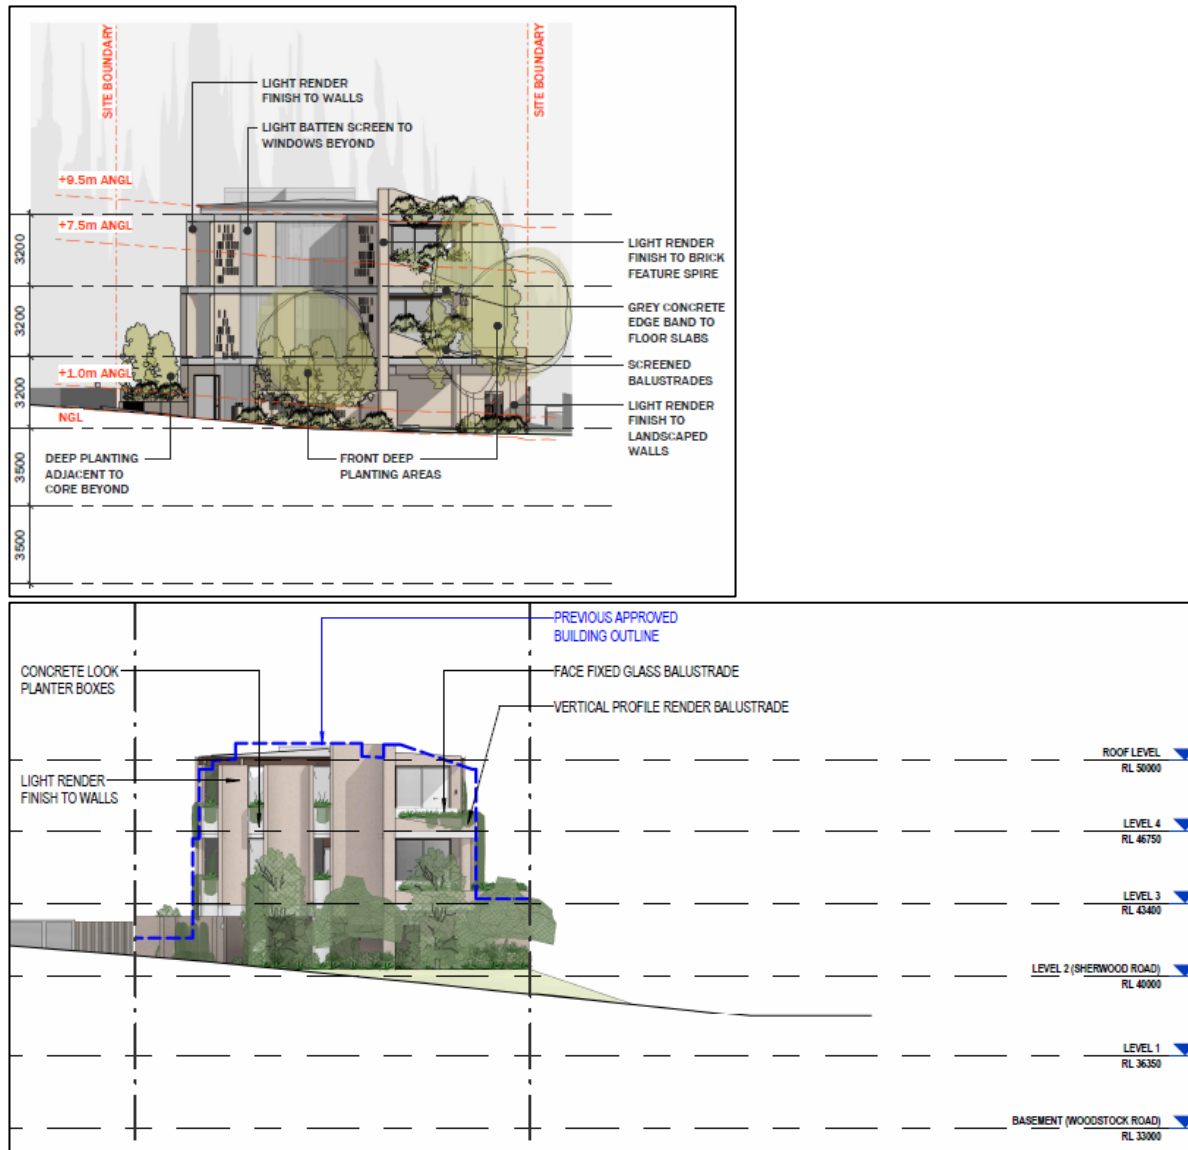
Comparison of the Sherwood Road facade, with the approved on the top and the proposed on the bottom
